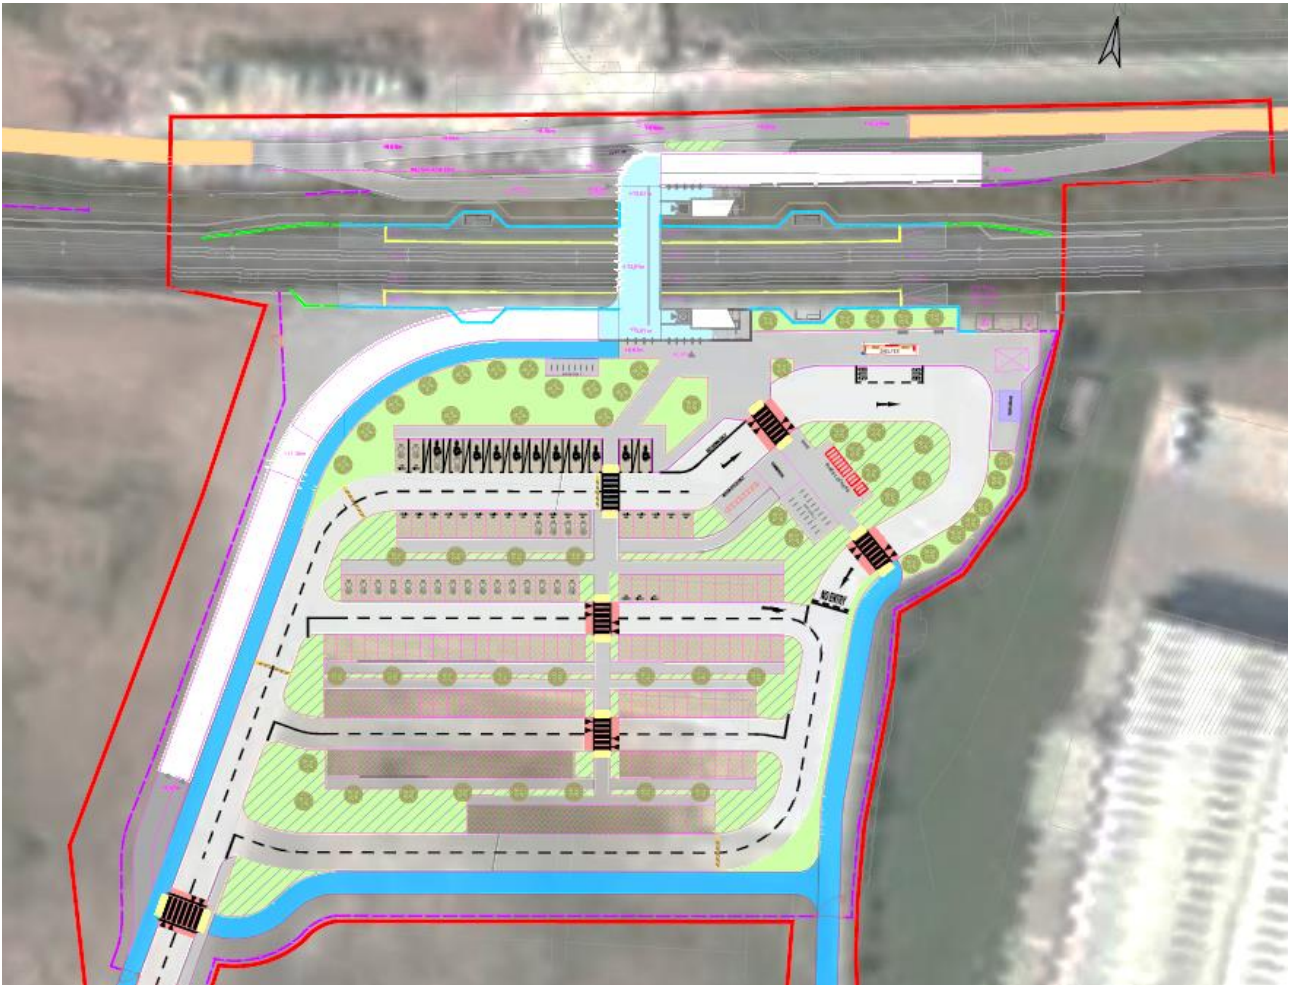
Carrigwohill West Station and Local Park and Ride Layout
